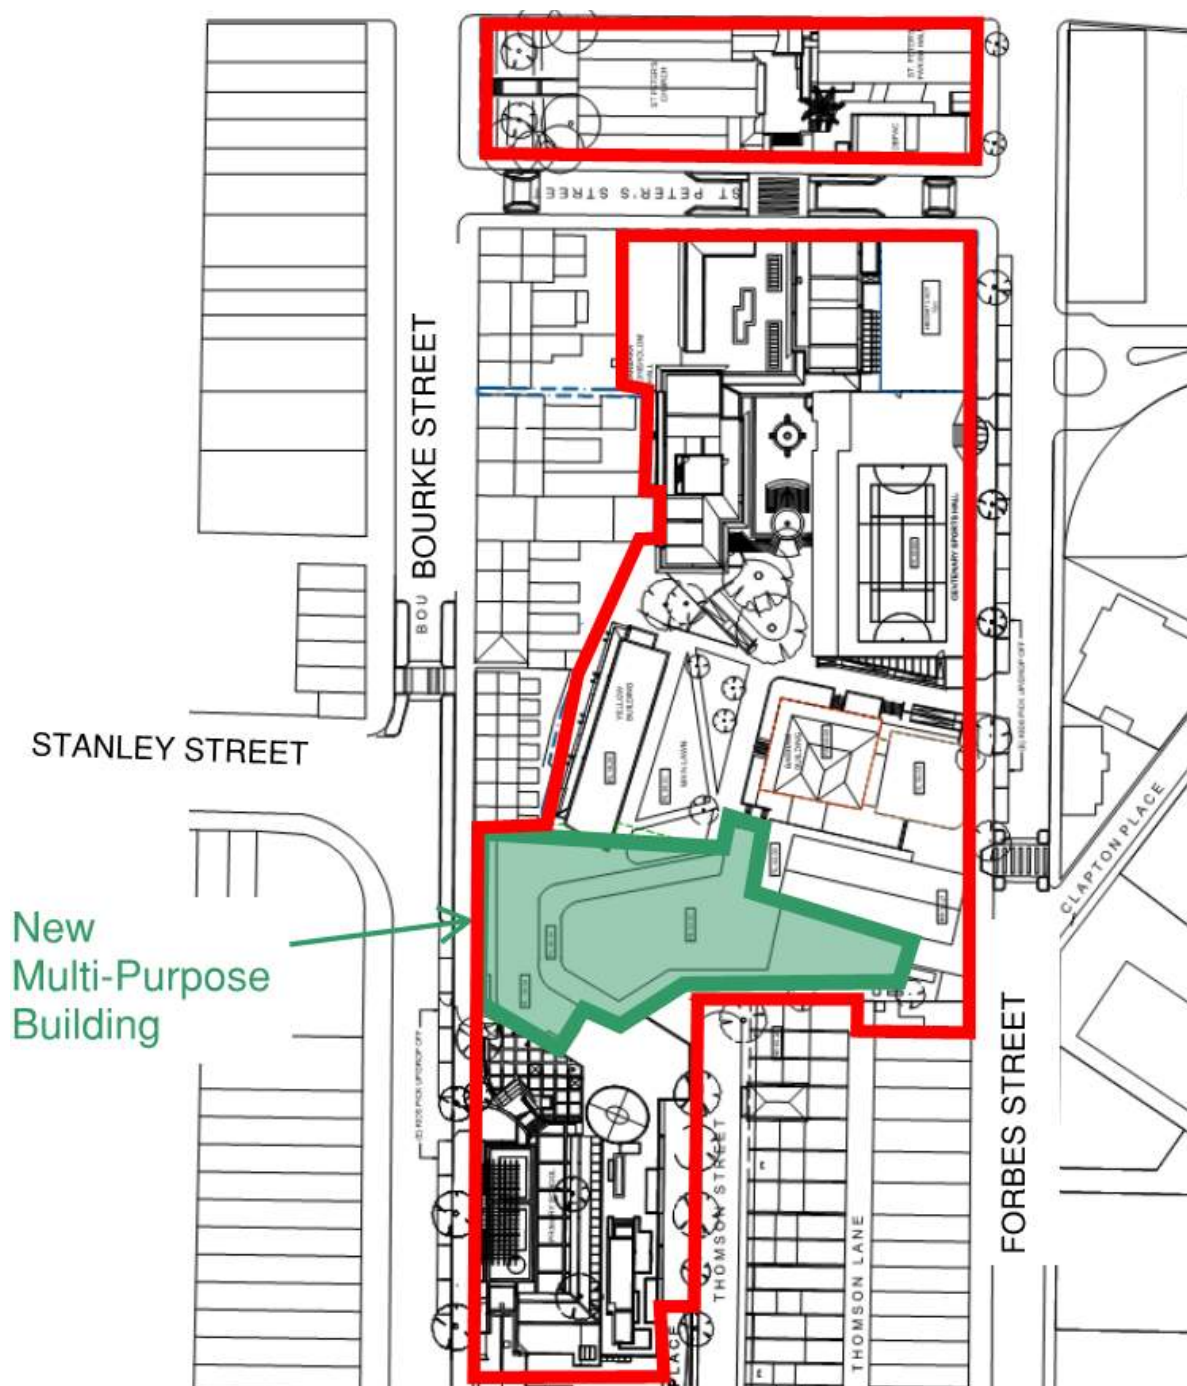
New Multi-Purpose Building (SCEGGS Darlinghurst 2040 Masterplan, 2018)
